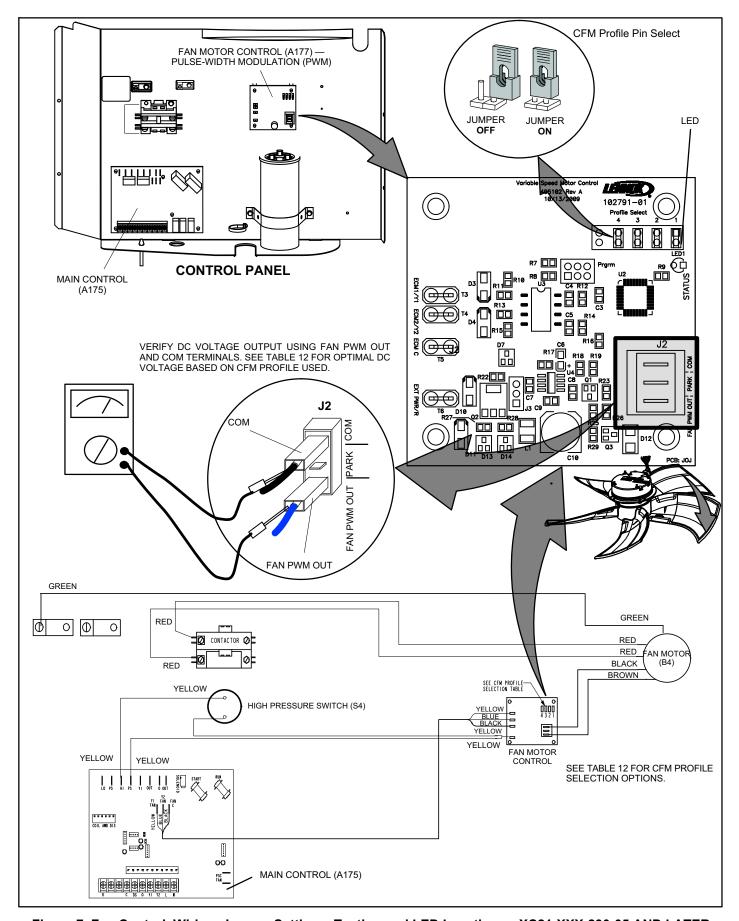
Fan Control, Wiring, Jumper Settings, Testing and LED Location — XC21-XXX-230-05 AND LATER
